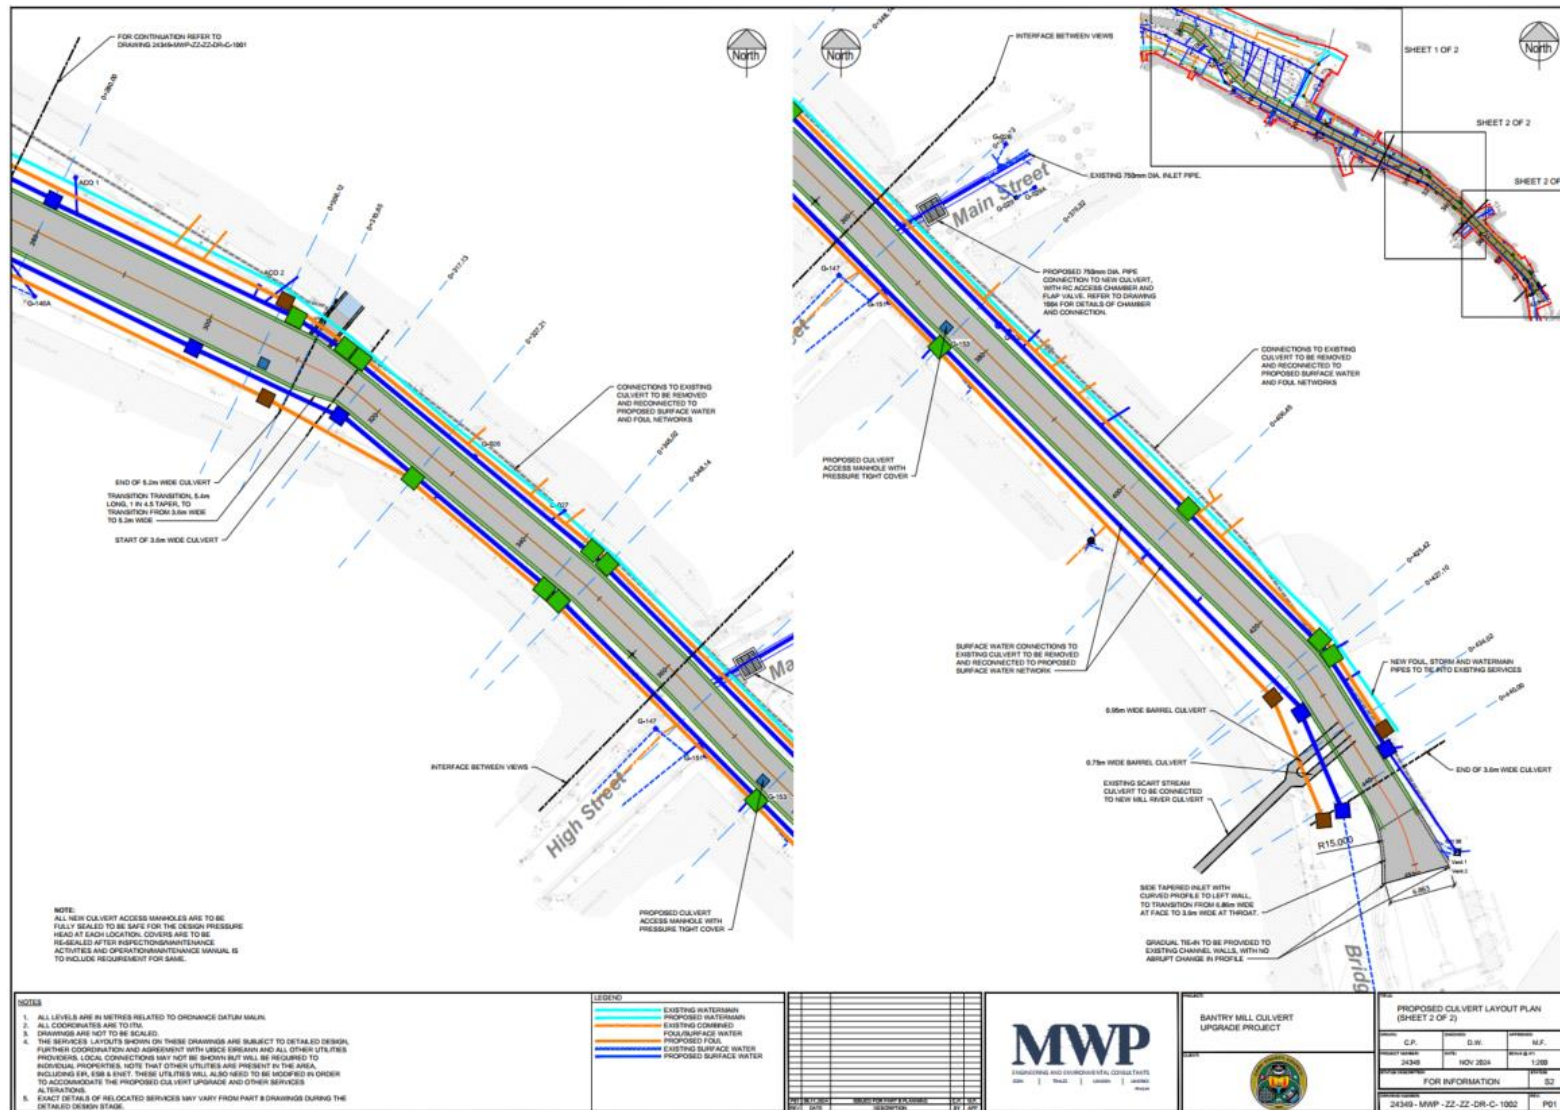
Proposed Culvert Layout Plan (Sheet 2 of 2)
